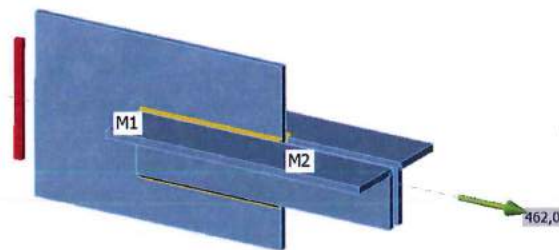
Benchmark example of the welded angle plate joint with parallel fillet welds
